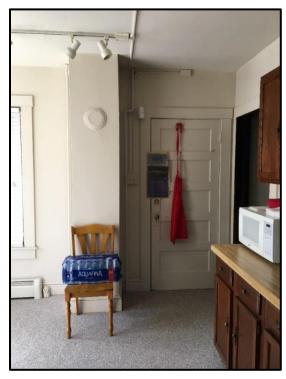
Kitchen Rear Wall (Southwest Room), Looking West.
